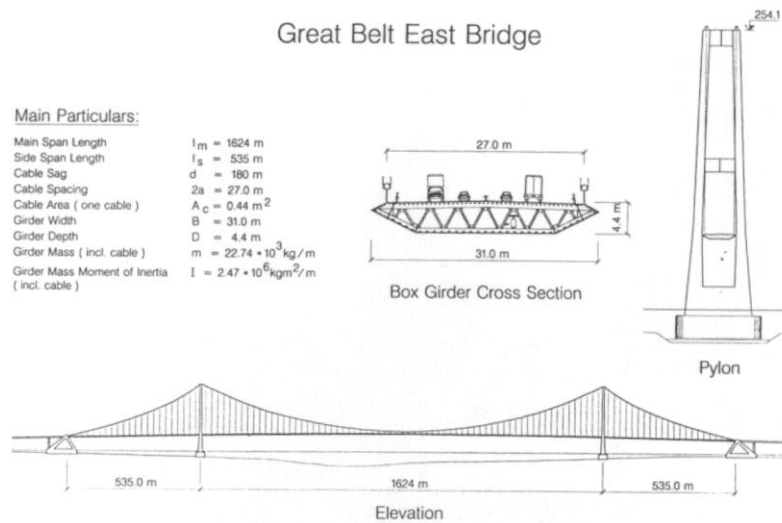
3]: Geometrical details of the Storebælt East Bridge [35].
